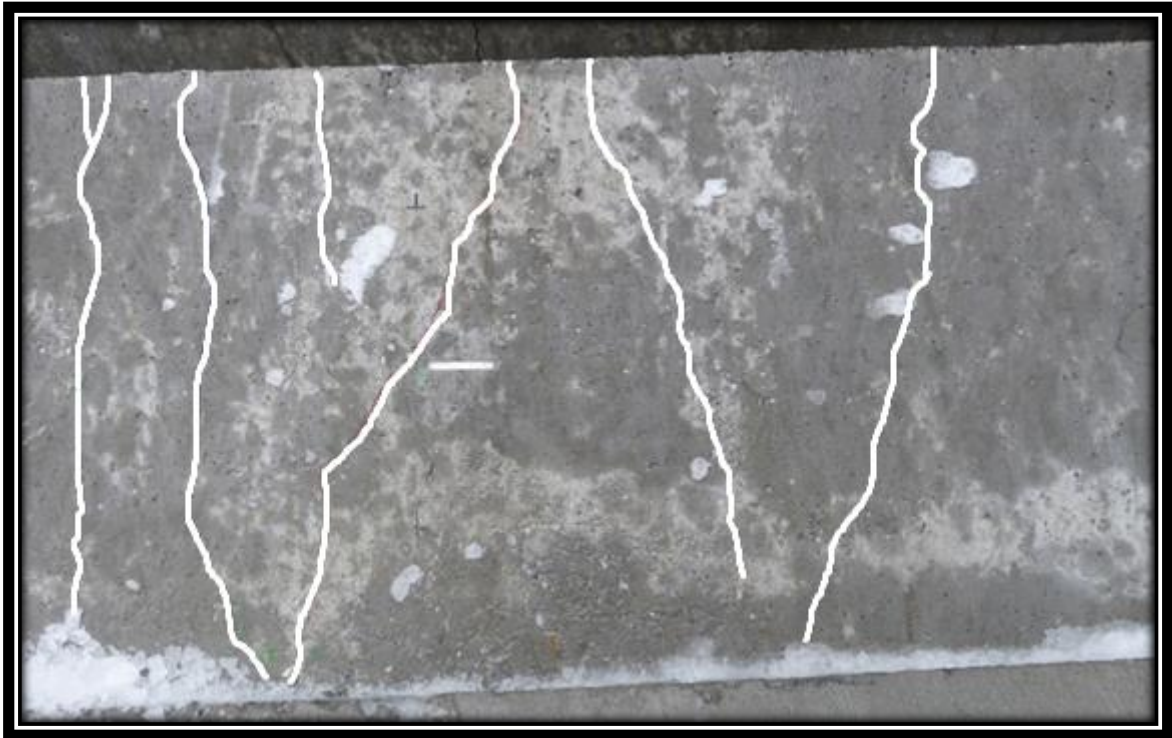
Discrete Connector Specimen 1—Crack Pattern (Bottom of Specimen)
